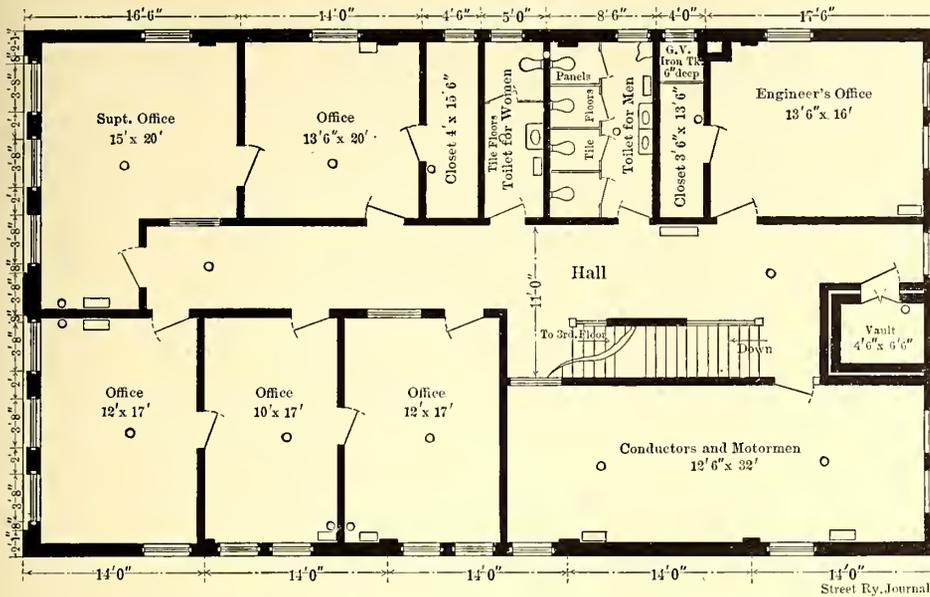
SECOND-FLOOR PLAN OF MICHIGAN TRACTION COMPANY'S KALAMAZOO TERMINAL BUILDING
